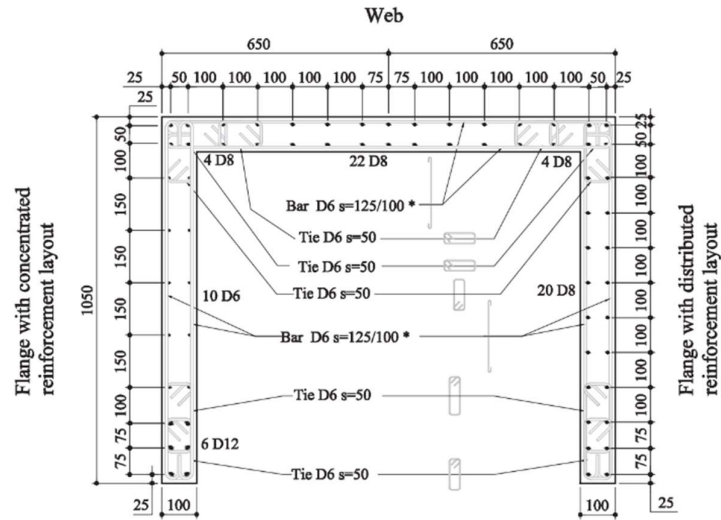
Cross section of the test specimen TUC scale 1:2.
